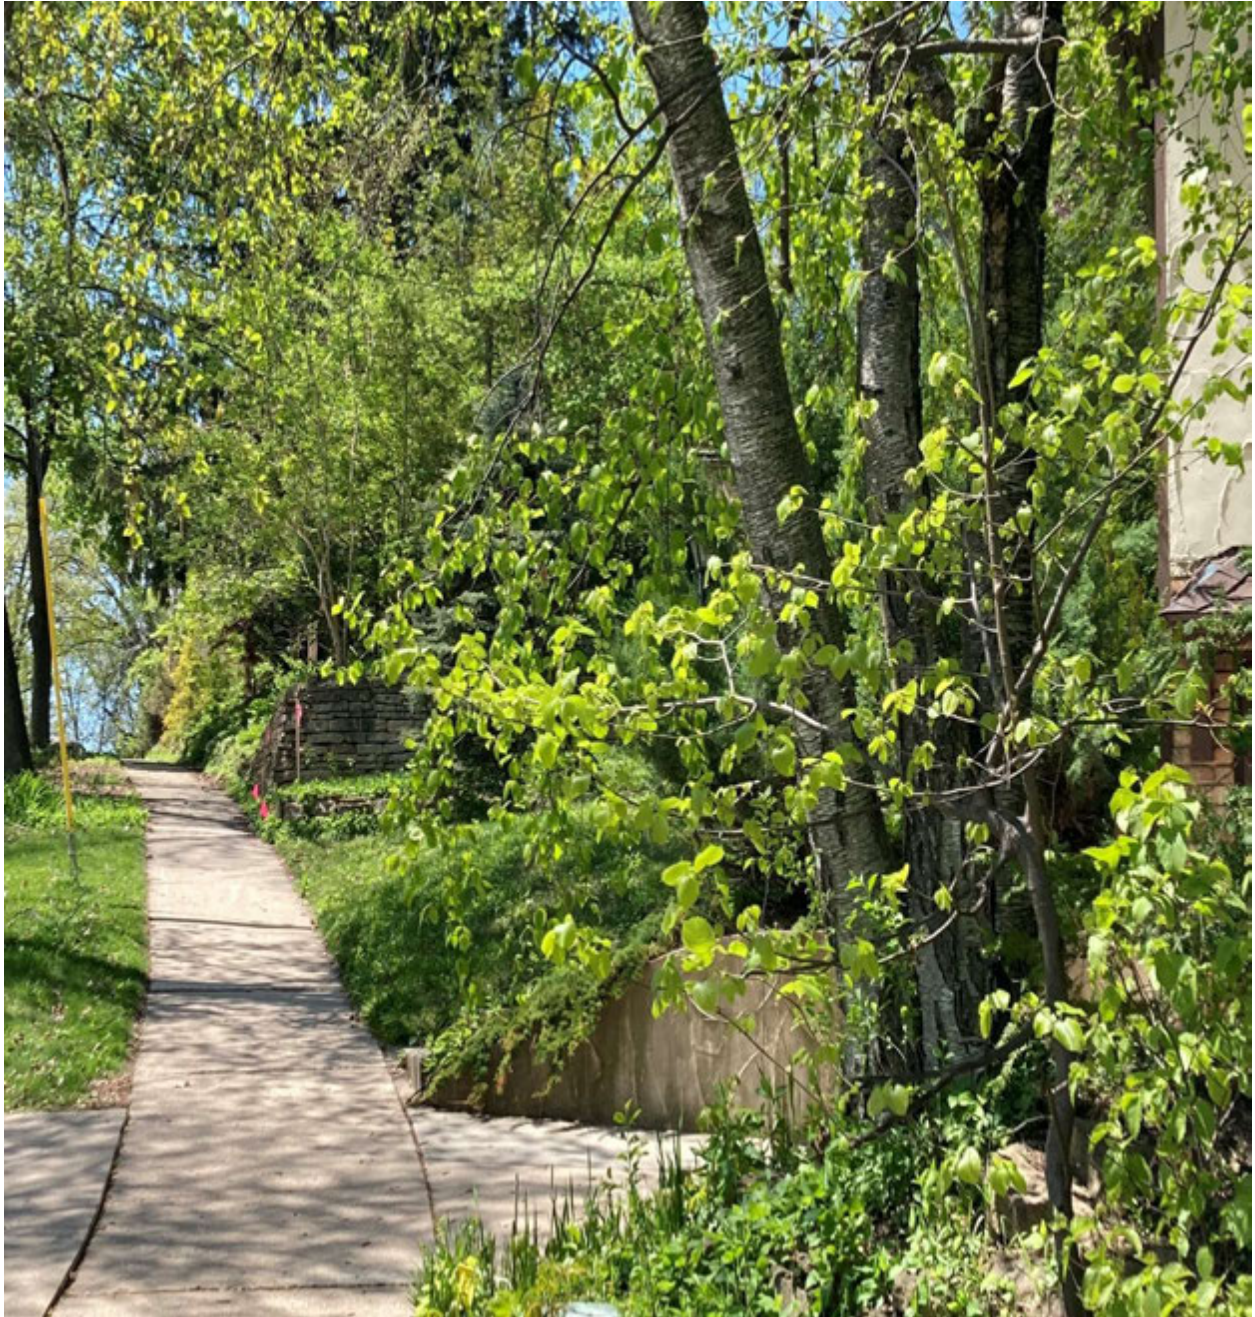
View from in front of 1806 Summit Ave, up the hill toward Ely Pl. You can see the survey flags marking the Applicant’s narrow strip of property, but the stone retaining wall behind the flags belongs to the Morehouse House.
